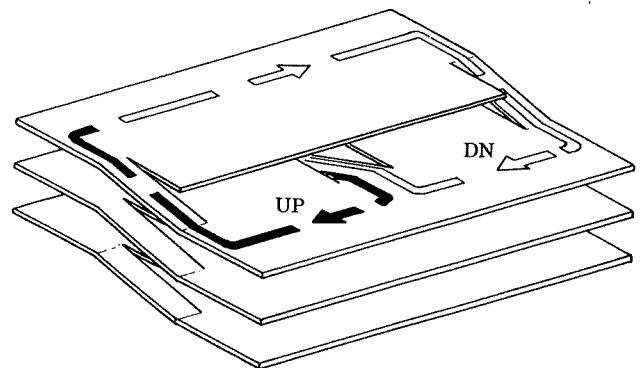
Tandem staggered floor ramp system. Ramps provide a clockwise circulation system.
